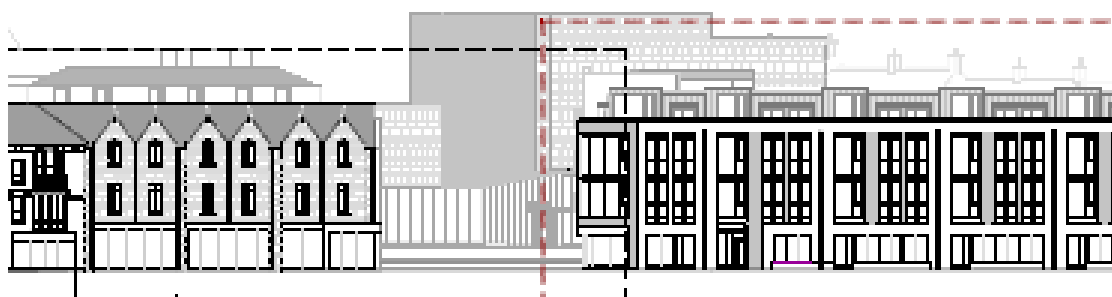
Queen's Parade elevation approved under W/2014/0456/F
